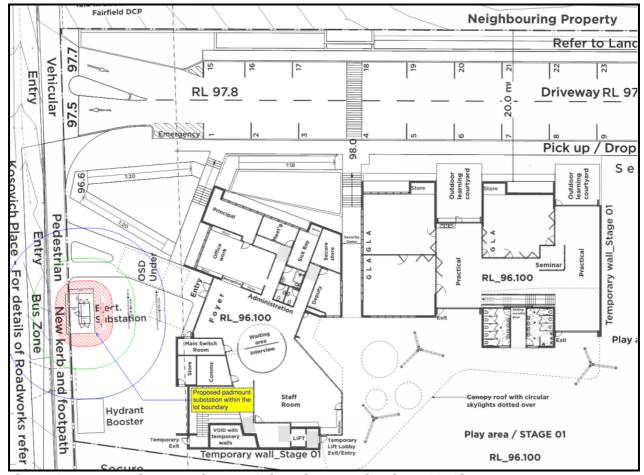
Proposed New Padmount Substation Location (JHA 2018)
